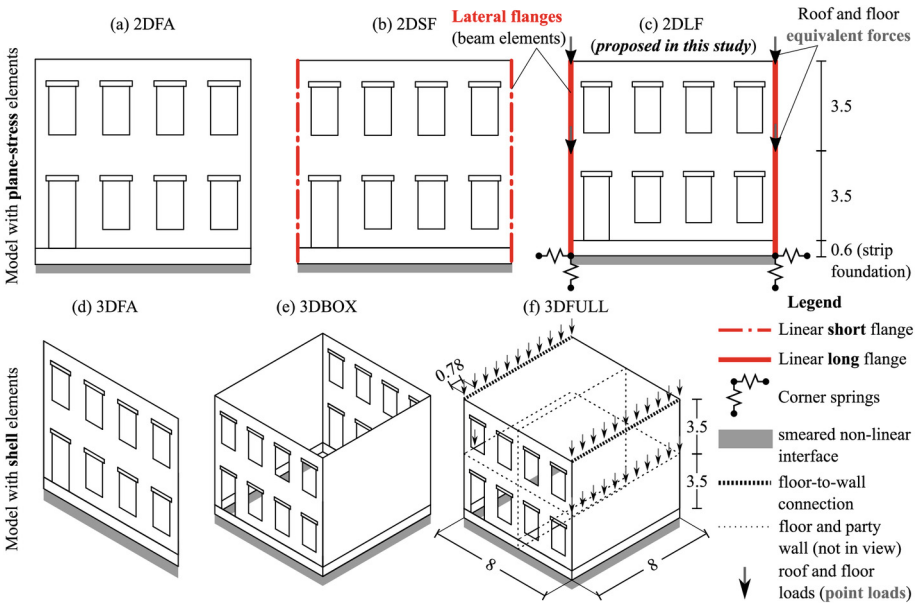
The selected modelling approaches for the two-storey masonry building with a width of 8 m for both the façades and the transverse walls, a total height of 7 m and single-wythe (i.e. the width of one brick, equal to 100 mm) walls.: (a) 2D façade model (2DFA); (b) 2D façade with lateral linear short flanges (2DSF); (c) 2D façade with lateral linear long flanges (2DLF); (d) 3D façade model (3DFA); (e) 3D model (3DBOX); (f) 3D full model (3DFULL).
